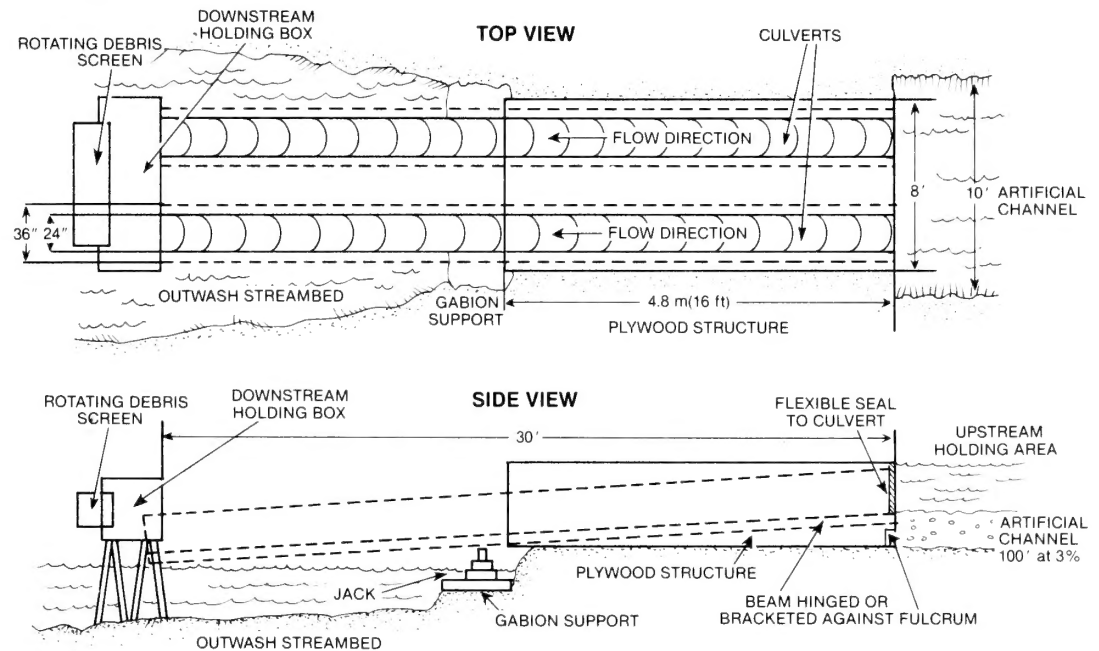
Baffled culvert installation; top view to show inlet and outlet structures.
